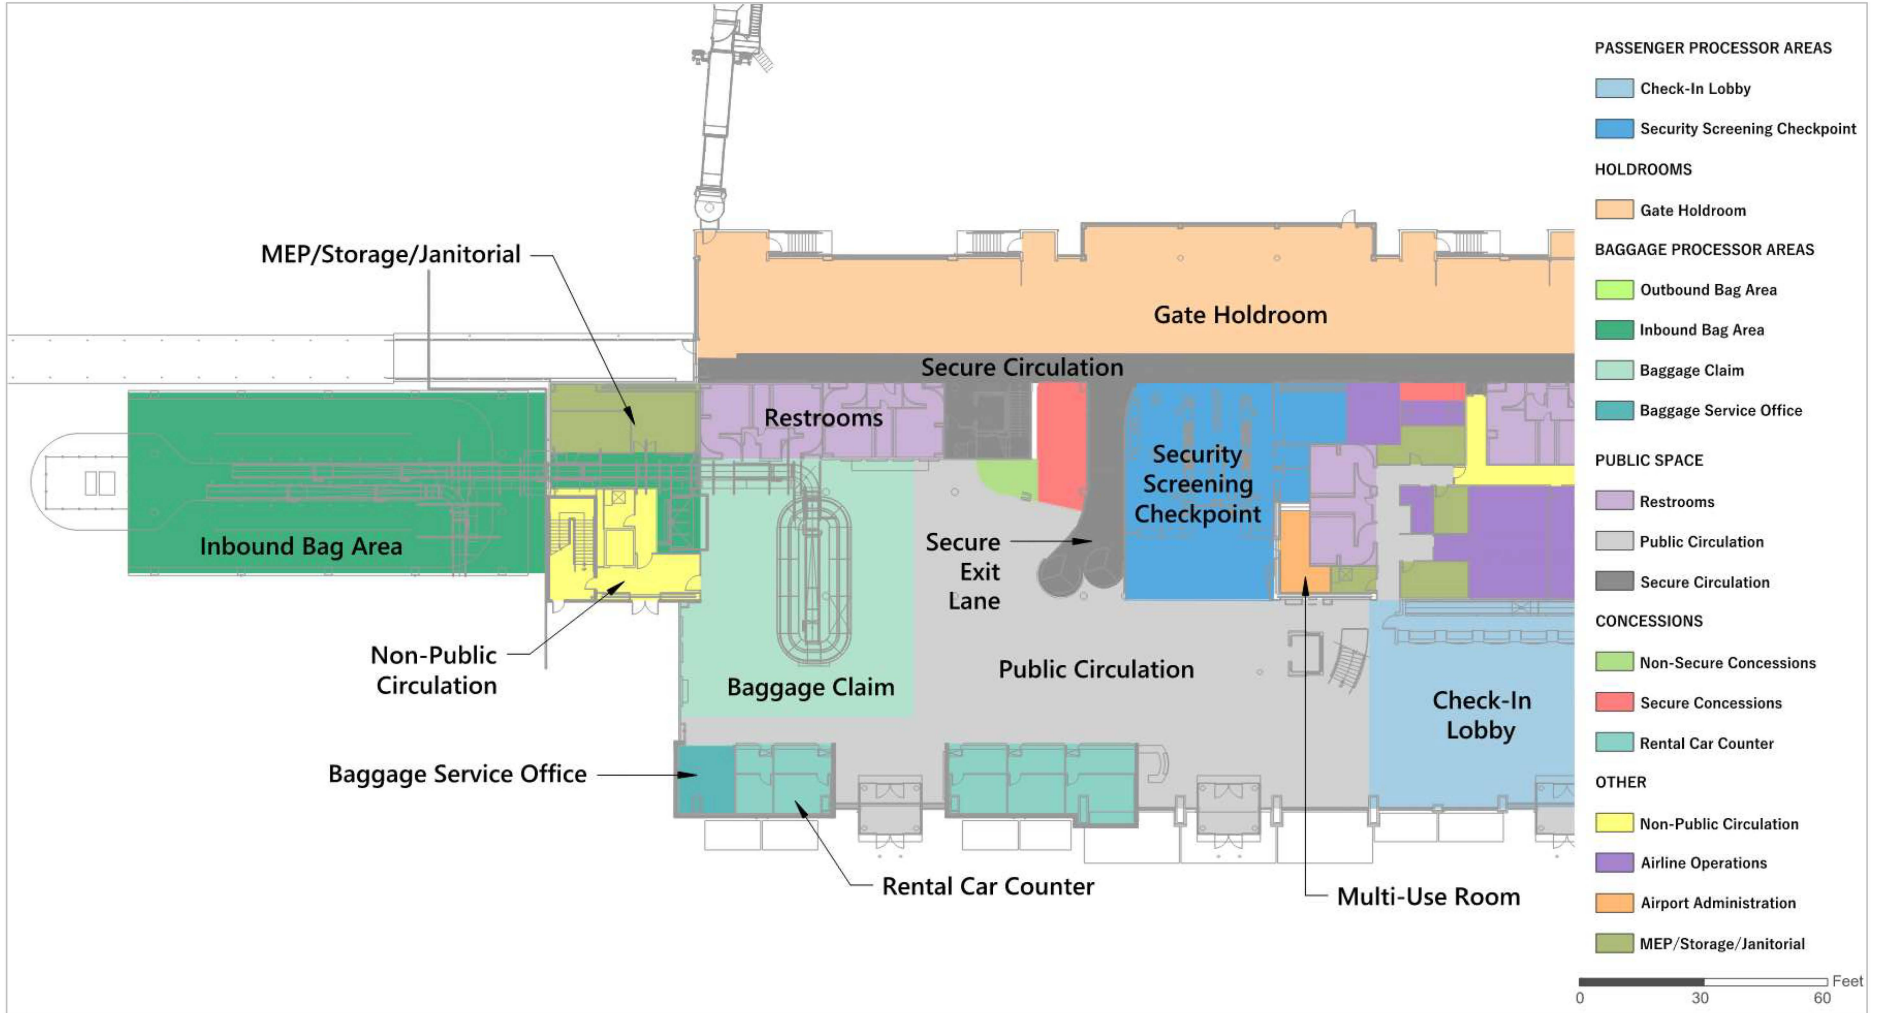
Passenger Terminal Building Floor plan – Main Floor South
